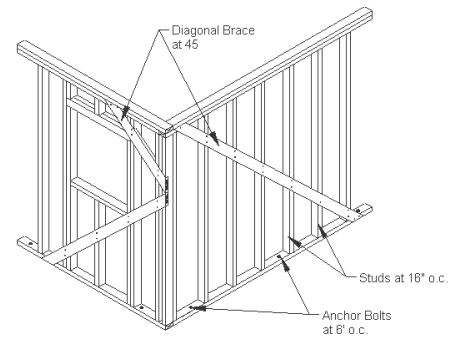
Changing diagonal let-in bracing to K-shape bracing when making an opening
